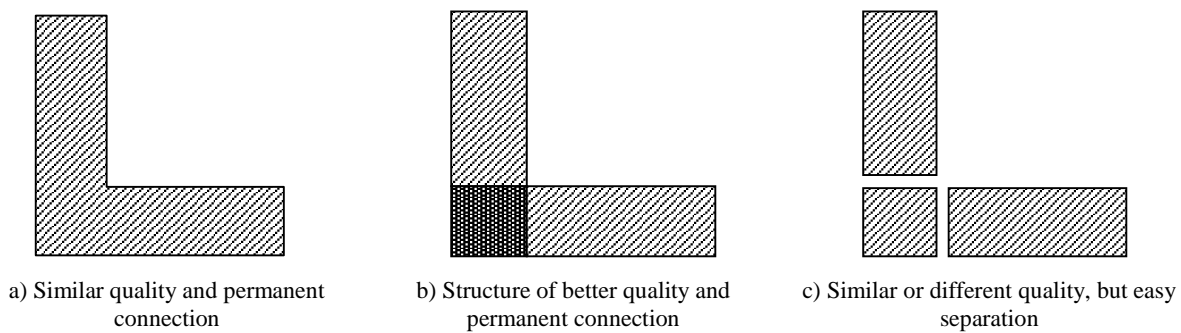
Connections between structural and wall systems. Adapted from Berge (2000)
